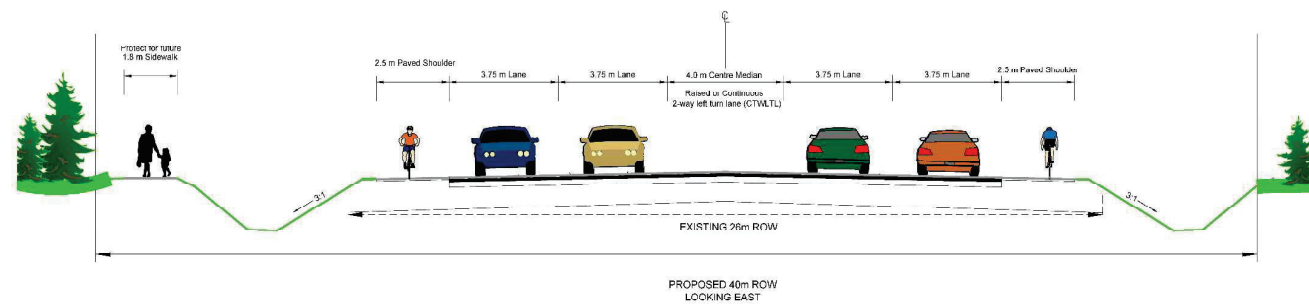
Section 2 Alternative 7 - 5-Lane Rural Cross Section
